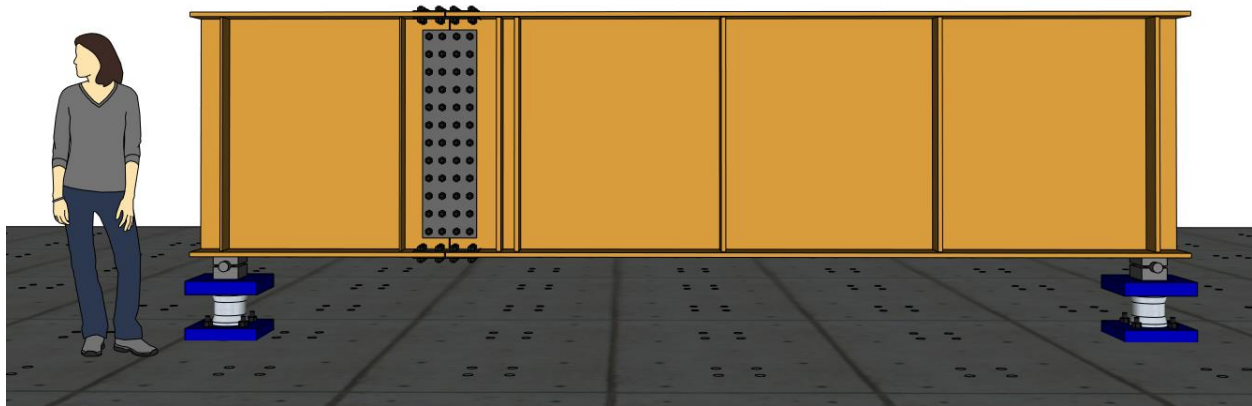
3D rendering plate girder specimen for experimental testing with splice connection
